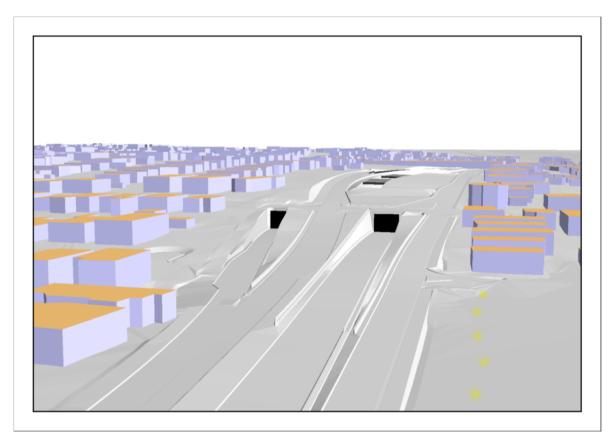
Reconfigured Wattle Street interchange (oblique elevation, facing south)
